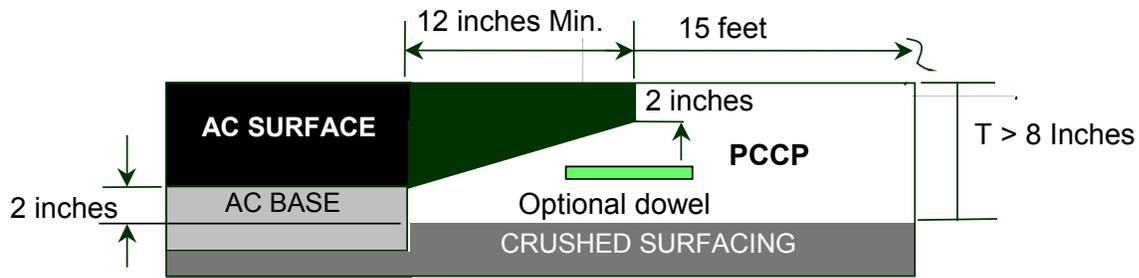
Asphalt to concrete transition (details courtesy of American Concrete Paving Association).
